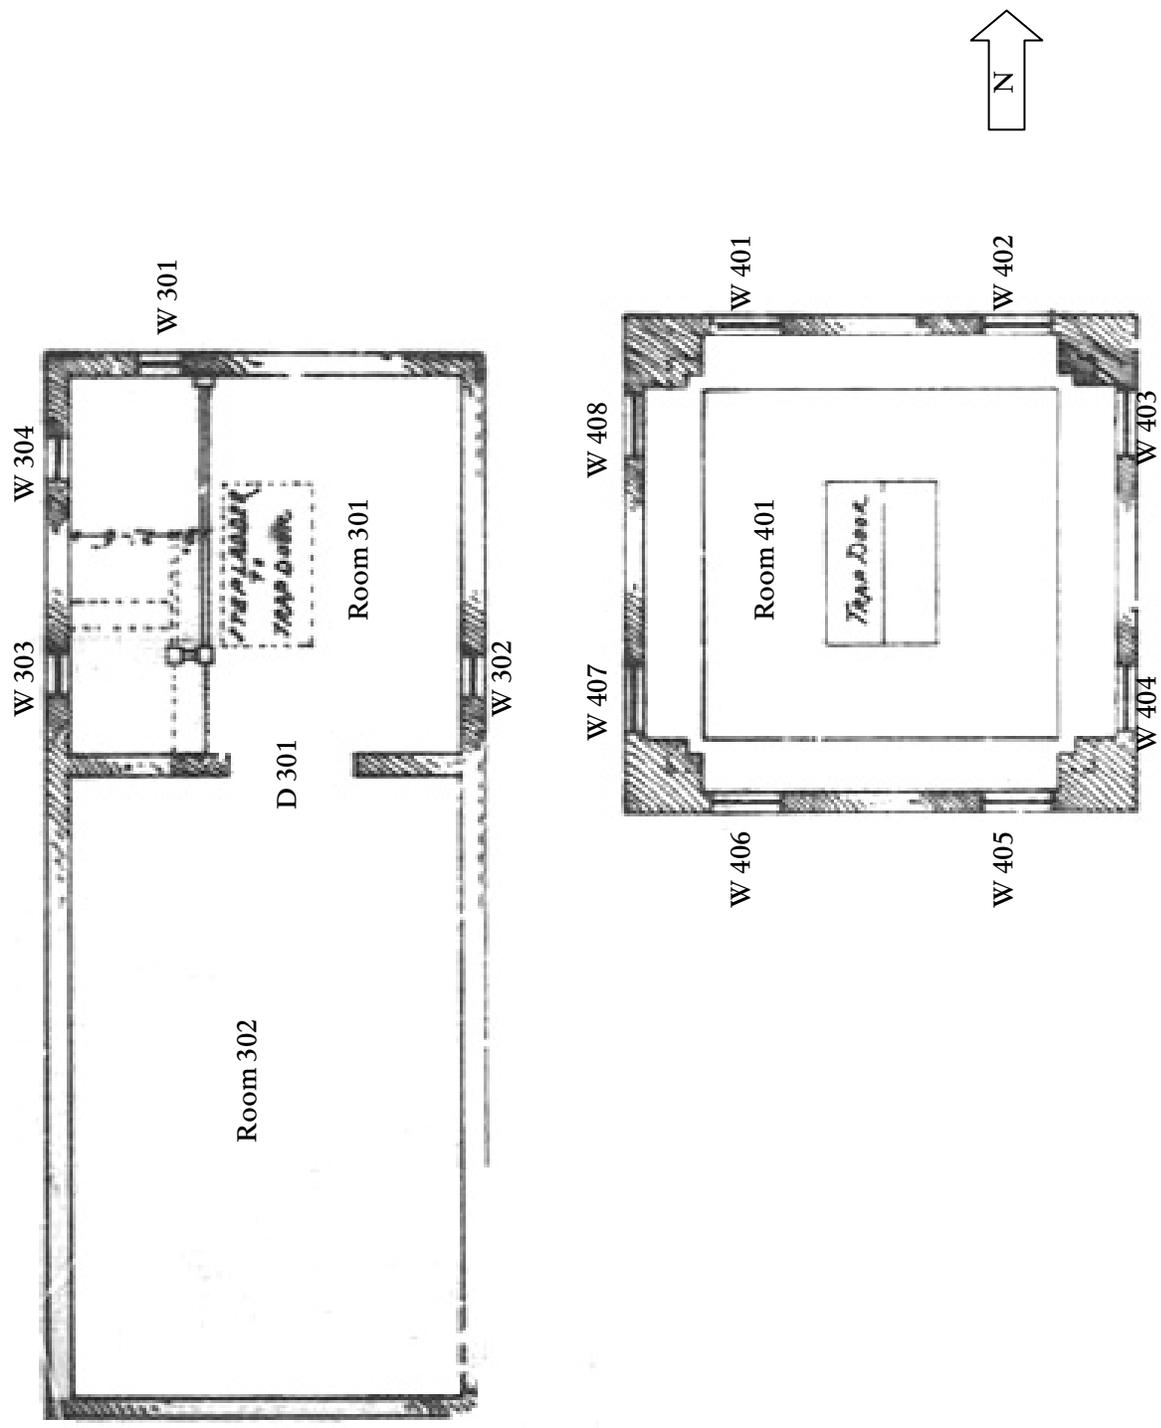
1894 Spermaceti Cove Life-Saving Station, third and fourth story plans with room, doorway, and window opening numbers.
